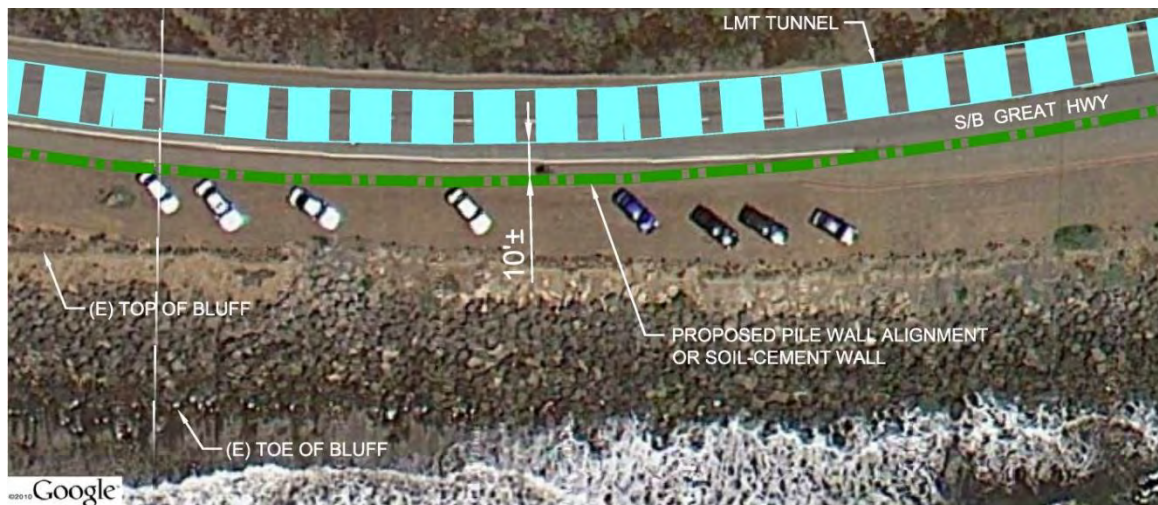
Typical Pile Wall Alignment (shown at EQR)
